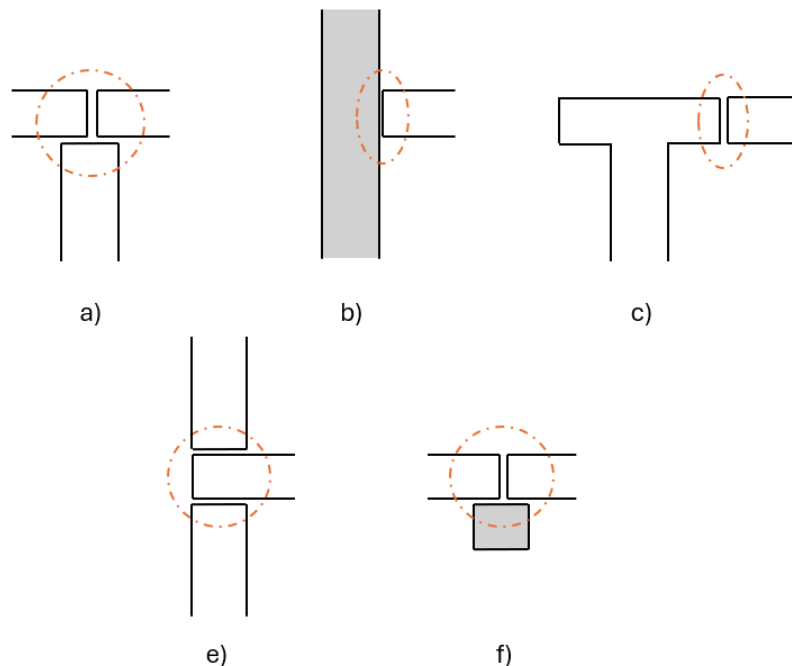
Connection schemes to be analyzed, a) double beam-to-column connection, b) Prefab column-beam connection c) T-shaped column-beam connection d) column-foundation connection e) wall-slab connection f) beam-slab connection
